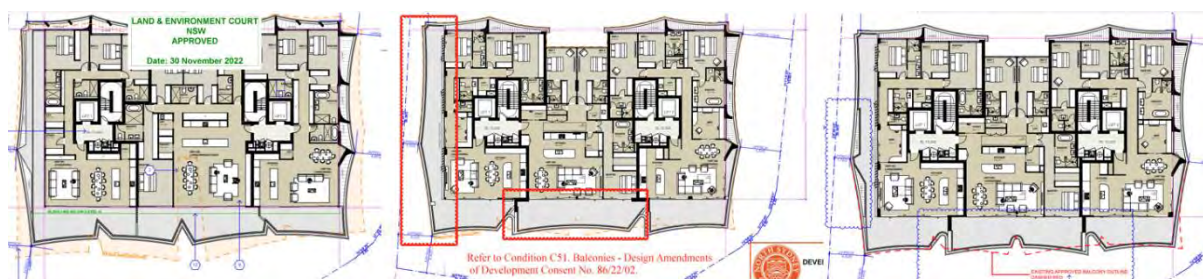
, 15 & 16 – LEC Approved Level 3 Floor Plan, DA 2005 Rev C (left), Annotated Level 3 Floor Plan, DA 2005 Rev F approved by NSLPP (middle) and Amended Level 3 Floor Plan, DA 2005 Rev H (right)
